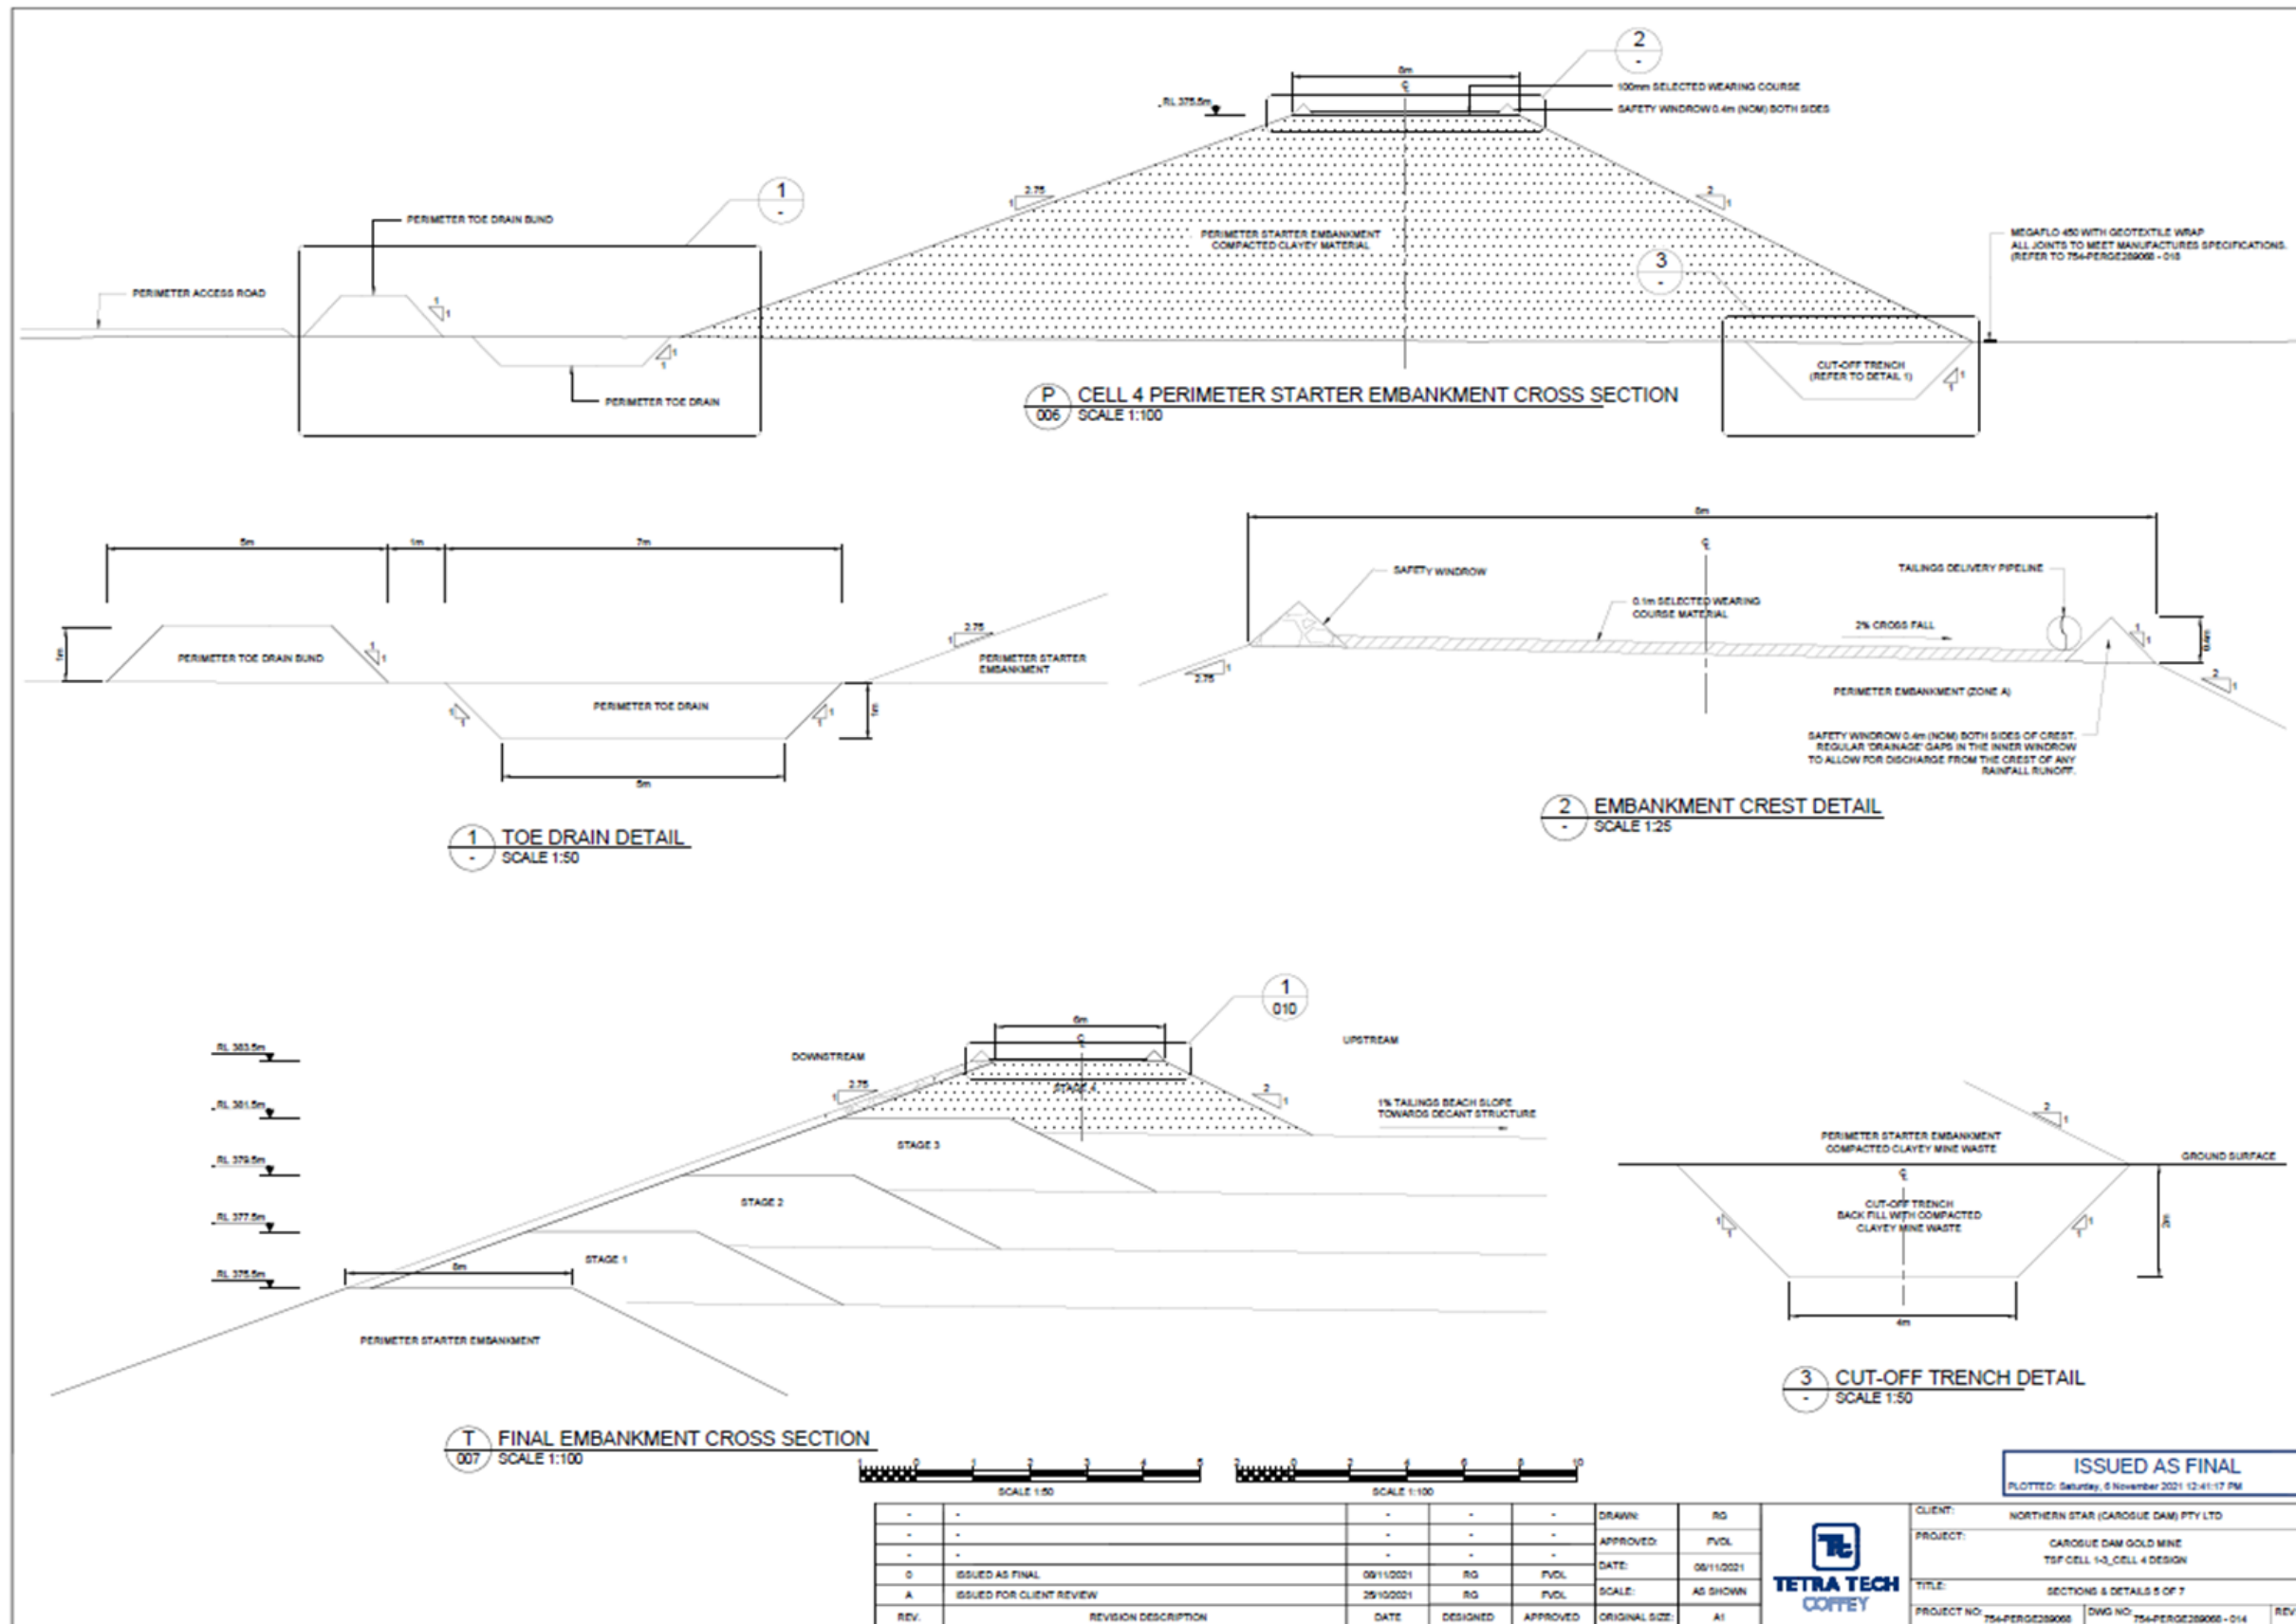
Cell 4 Perimeter wall design with toe drain and cut off trench details
